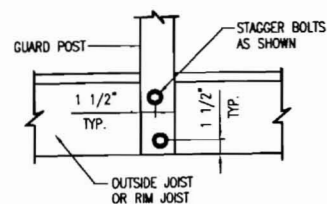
GUARD POST ATTACHMENT DETAIL
